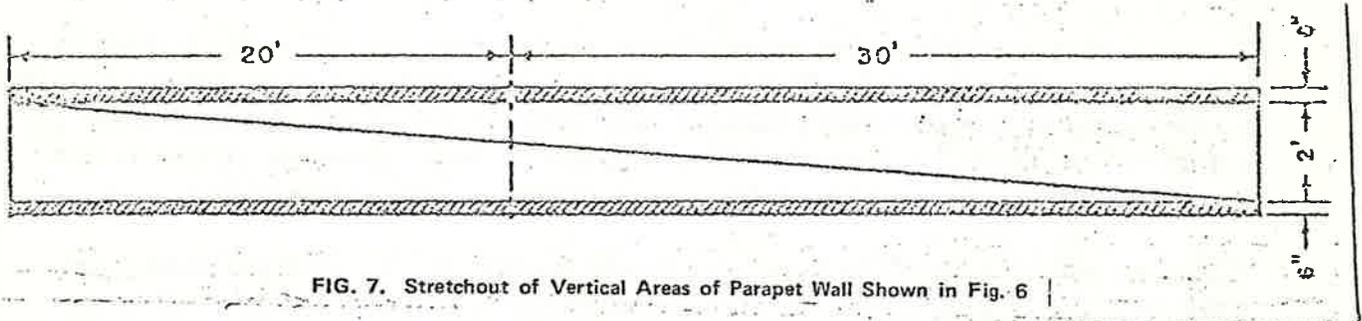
Stretchout of Vertical Areas of Parapet Wall Shown in Fig. 6
